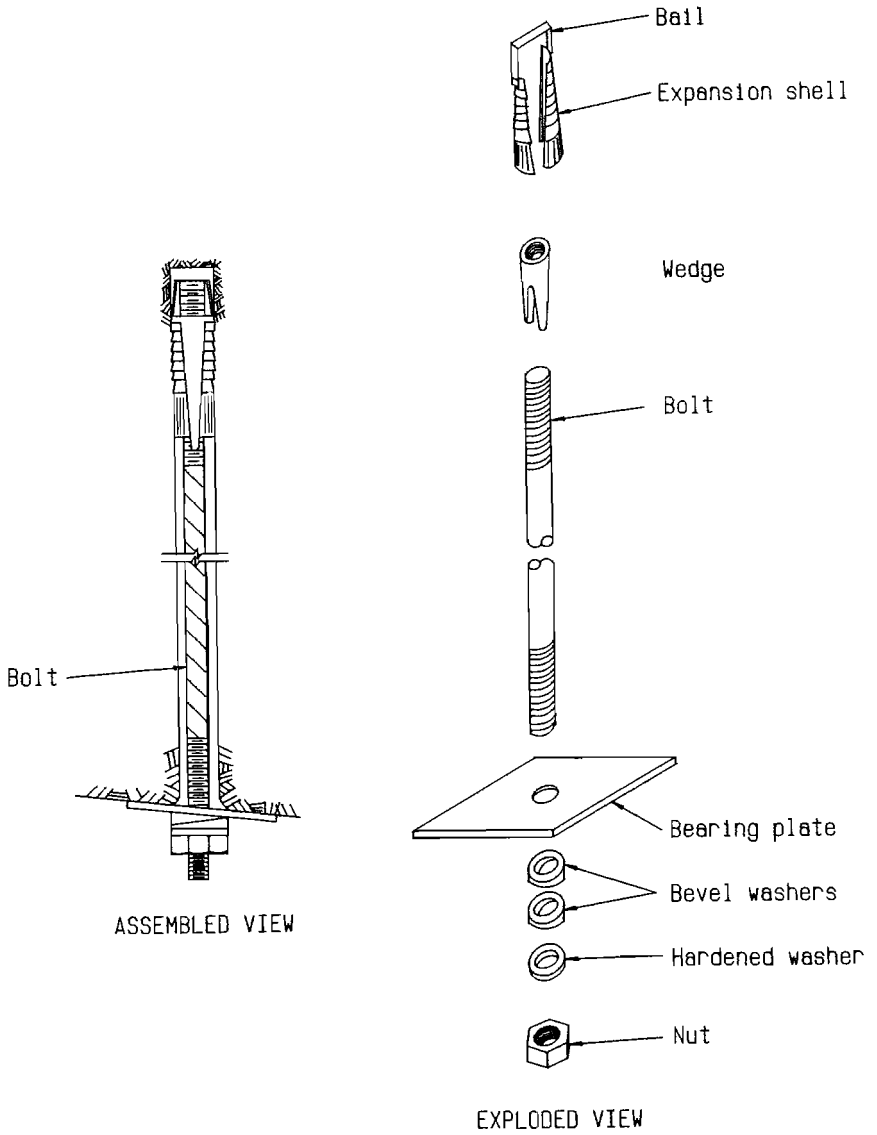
Bail Expansion Anchorage--Solid Bolt (U.S. Army, 1980).
